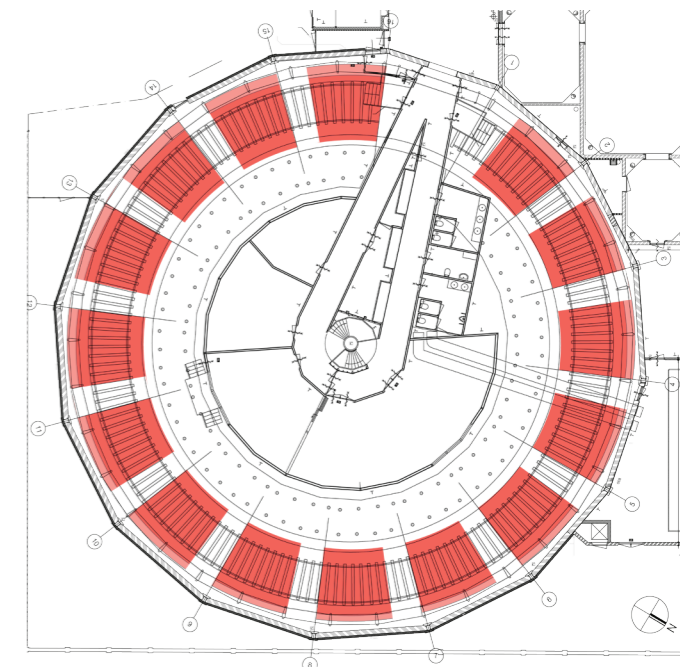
Plan of the Rotonde with the area of the potential underground storage location (source: own).
